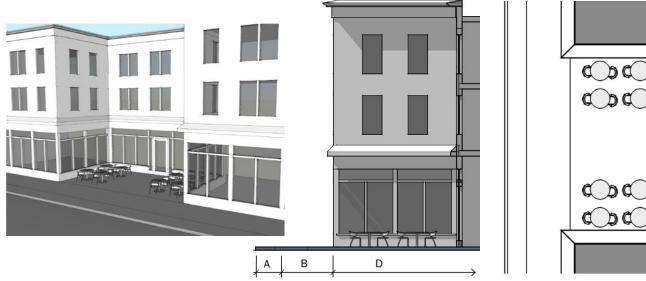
Illustrative View, Section View, and Plan View of Storefront Frontage Type
